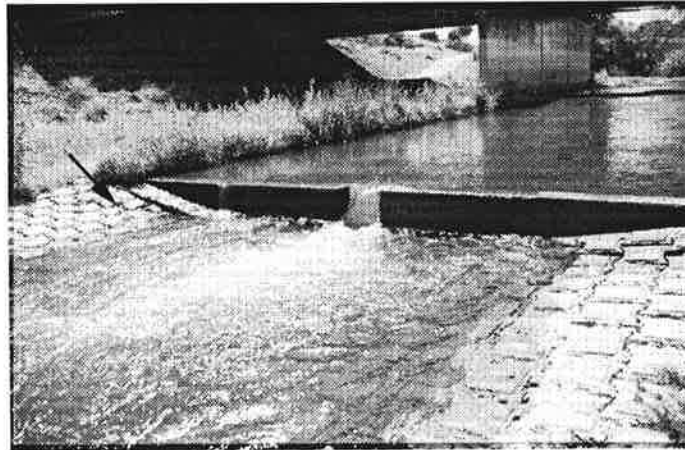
Shows undermining of the blocks related to the geotextile matting immediately downstream of a small grade control structure.
